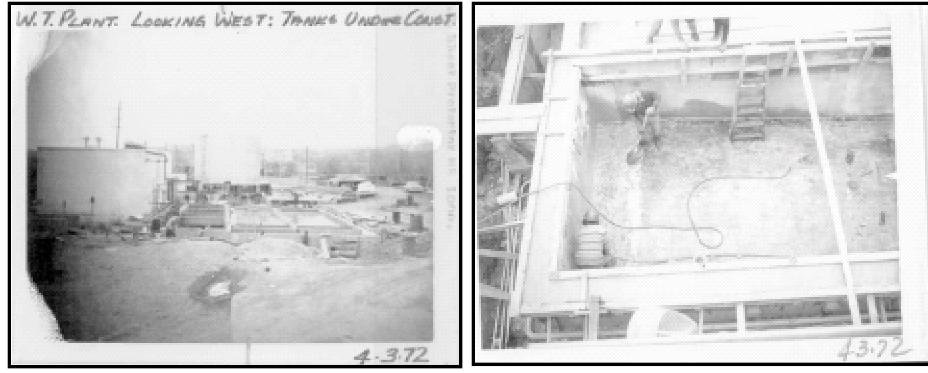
April 3, 1972 photo. View looking west, east of new WW tanks for Bldg 41. Apparent sump/cover at northeast corner of WWTP building.
